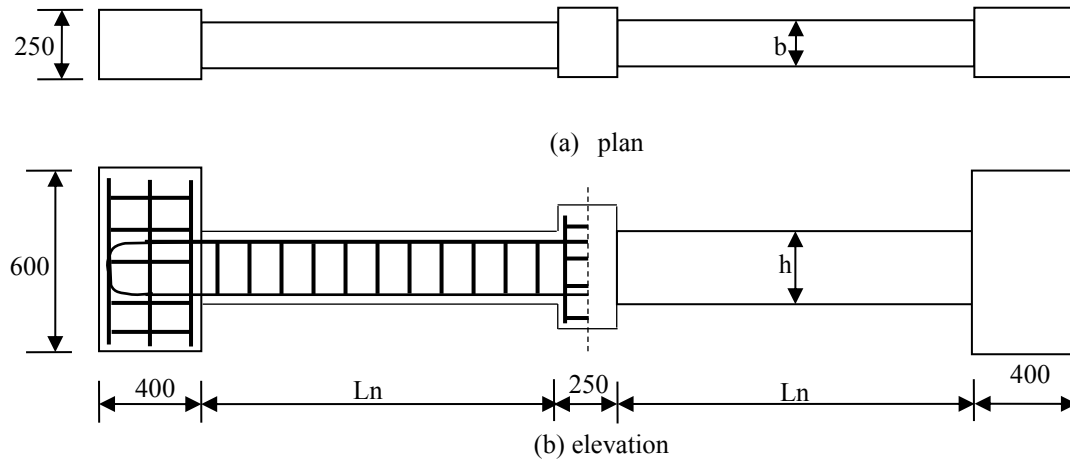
Plan and elevation view of RC assemblages (after Su et al., 2009)
